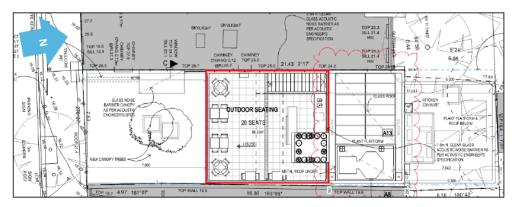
Proposed Roof Terrace Plan (Image Source: YBL Remmus Architecture)
